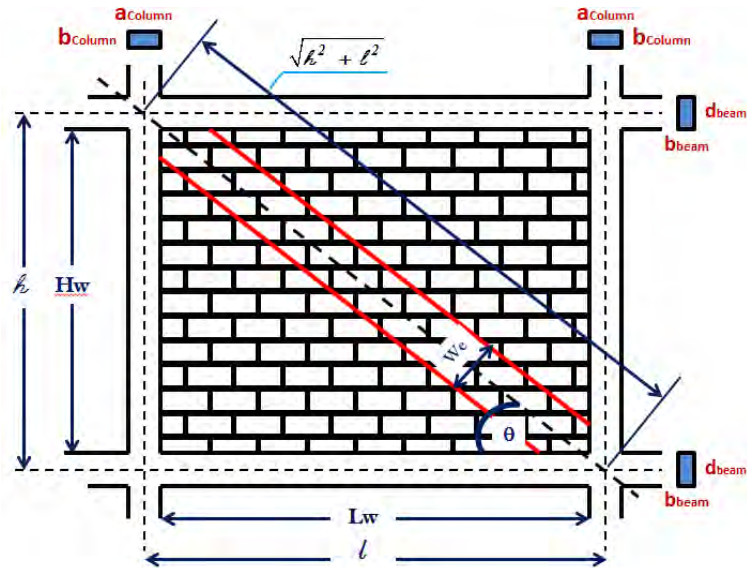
Equivalent strut model for masonry infill walls in frame building structures
